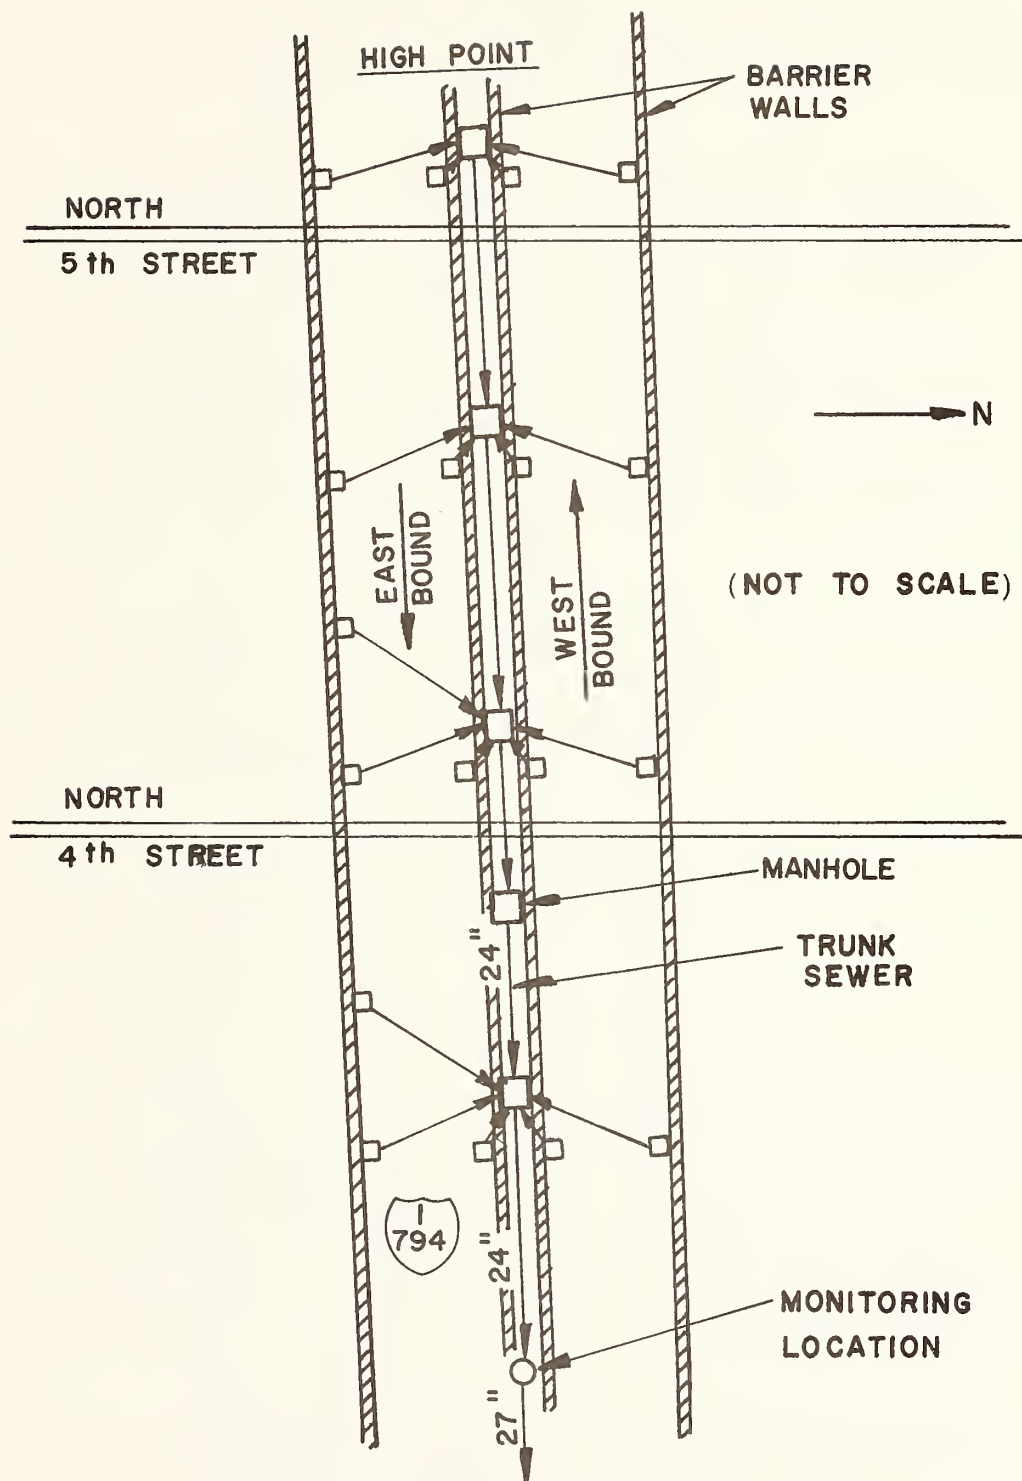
Schematic drainage plan, I-794, Milwaukee, WI
